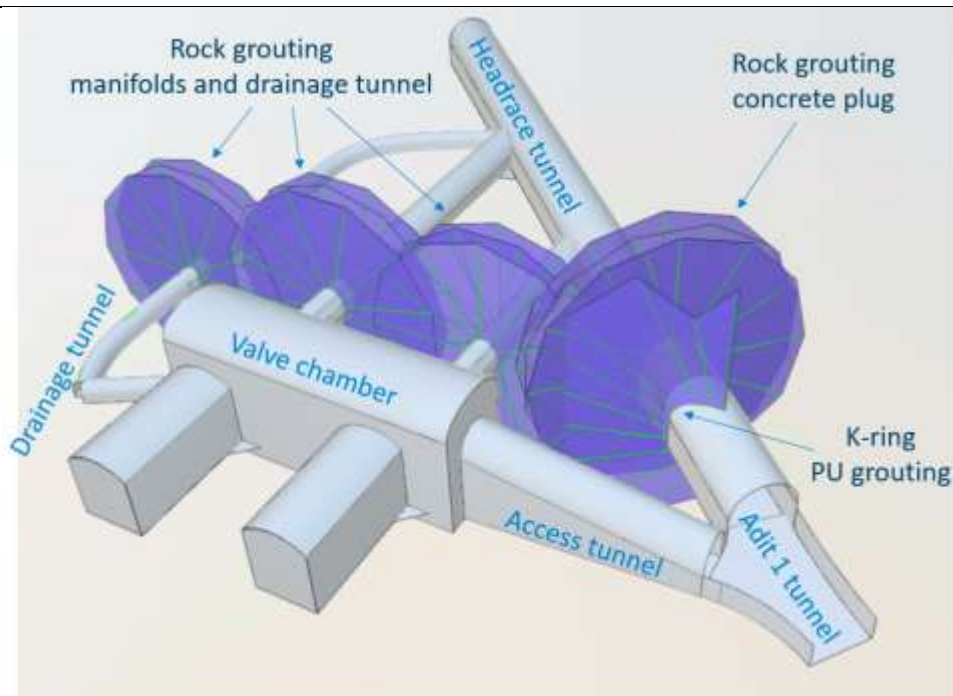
Layout in the valve chamber area and location of additional grouting curtain from 2008 (K-ring).
